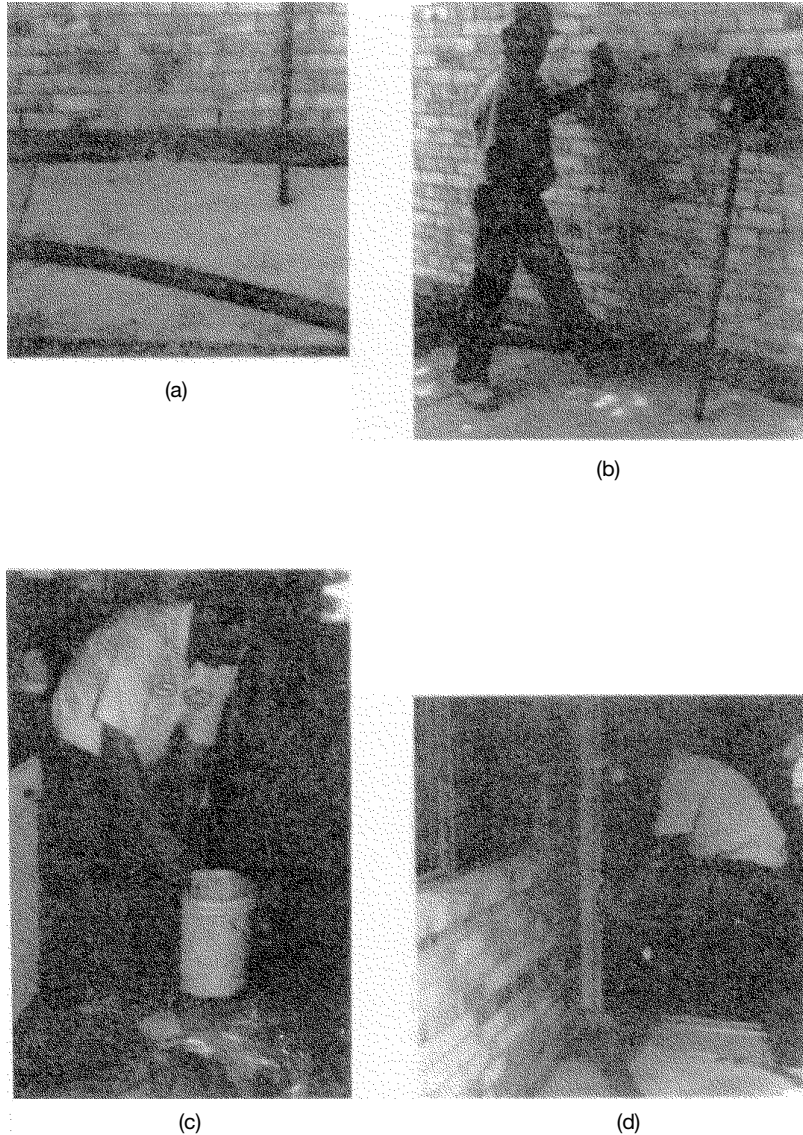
B.2.3. Mudjacking a slab. (a) Injection hole drilled through perimeter beam. (b) Nozzle in place and mudjacking in progress. (c) Interior pumping. (d) Exterior pumping of patio slab.
